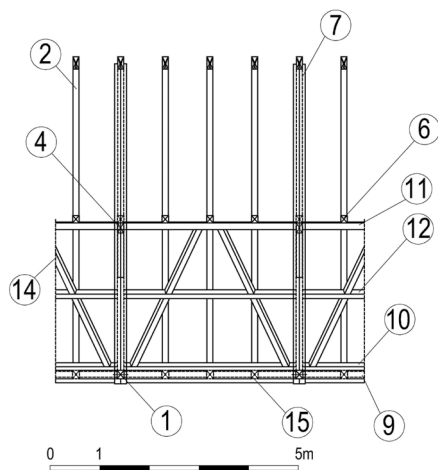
c. – typical longitudinal bracing system with baroque character; the system proper is made up of the following elements:
